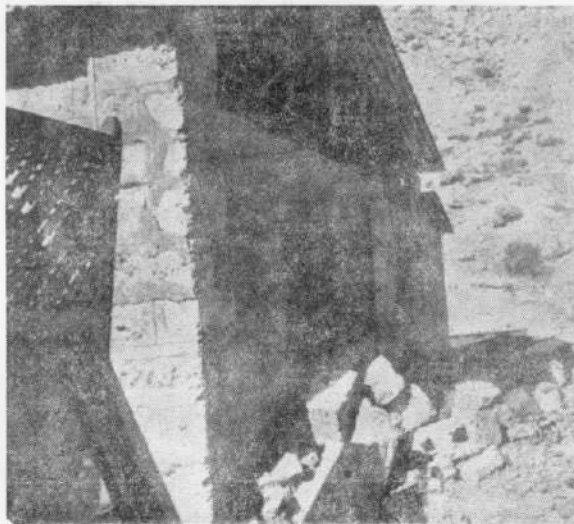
Collapse of gable end wall, made of hollow concrete blocks near Sumdoh village.
